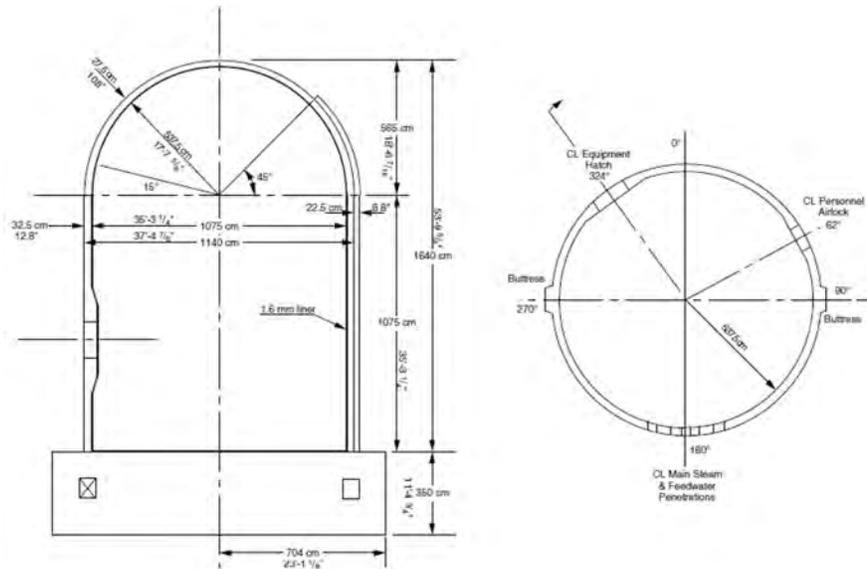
Geometric details of the prestressed concrete containment test vessel, Hessheimer et al. (2003)
